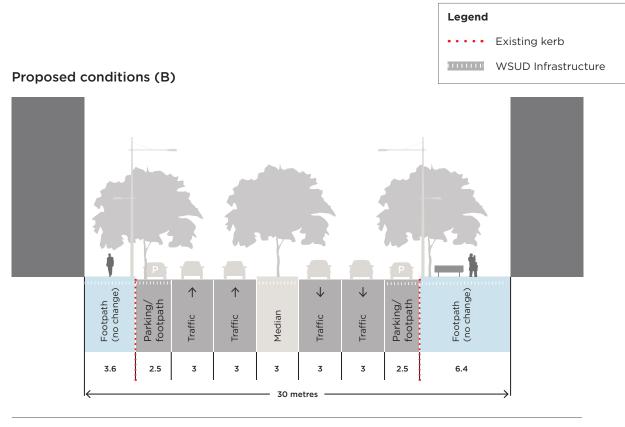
Proposed conditions of City Road looking east towards Power Street (Section B)
